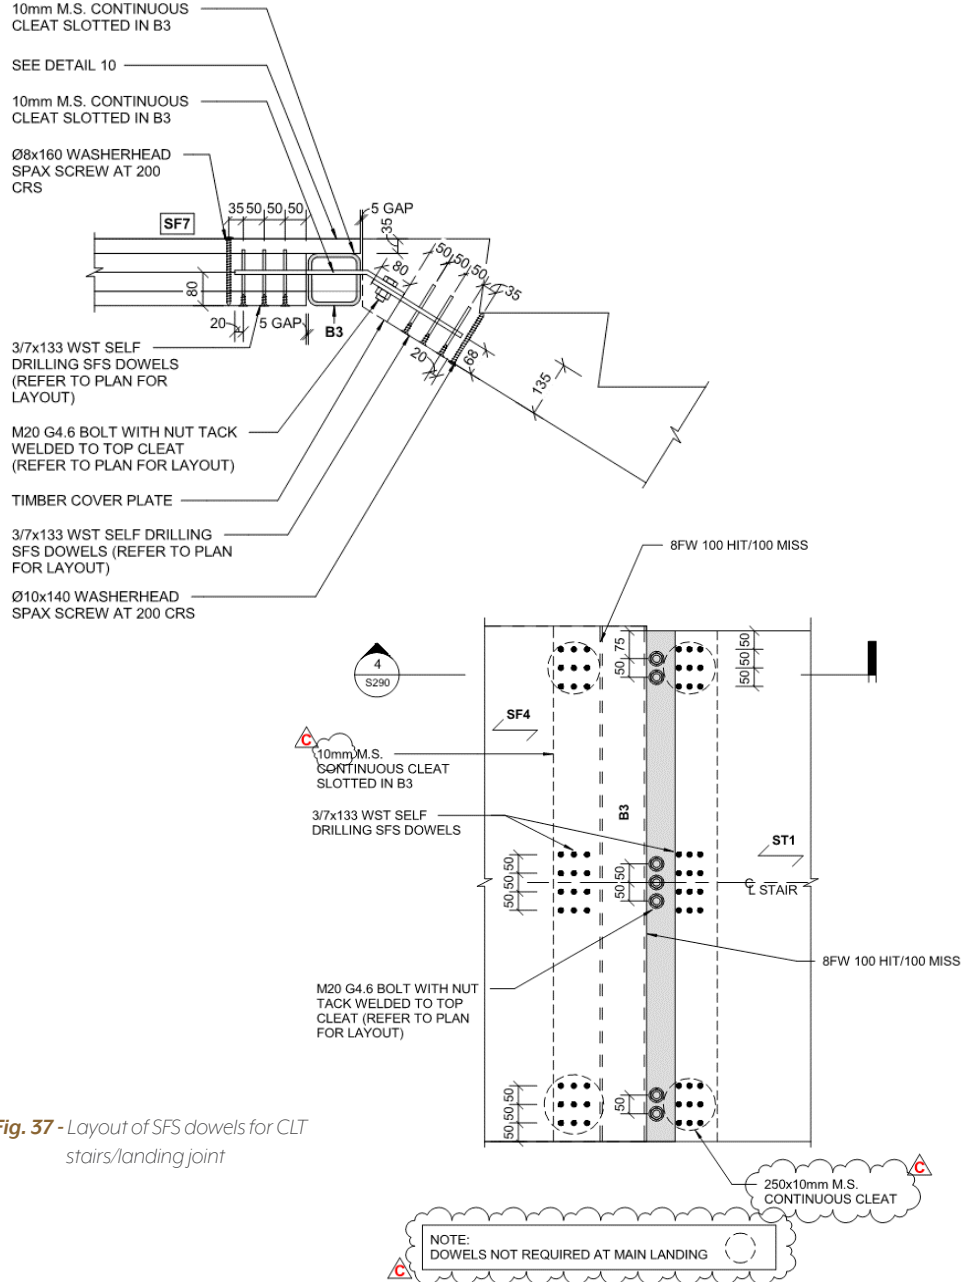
Layout of SFS dowels for CLT stairs/landing joint
